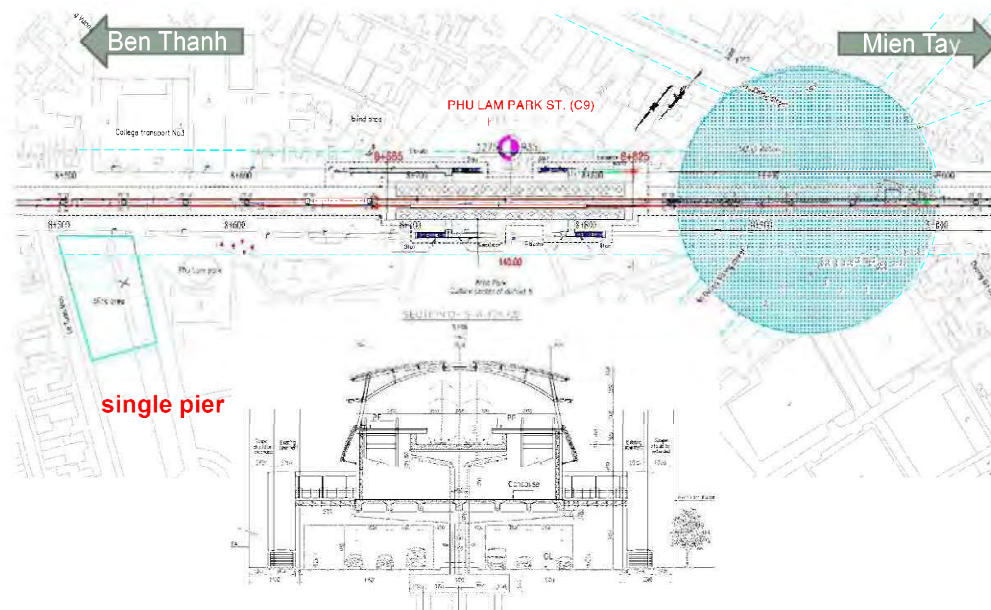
Plan and Profile at C9 Proposed by the JST
